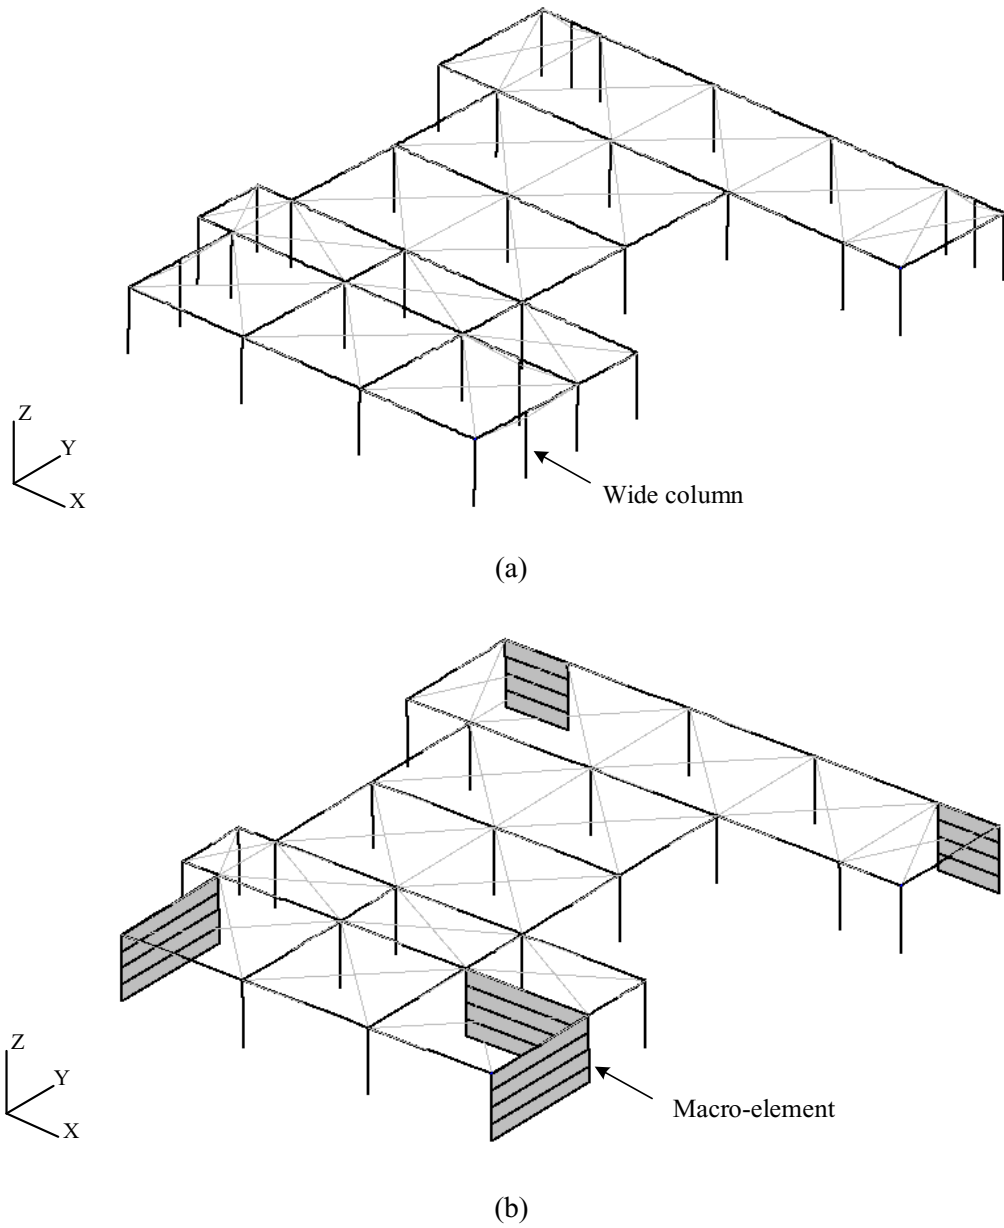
Illustration of RC walls modelling - finite element models of the 4th floor: (a) wide column (WC) model; (b) shear wall macro-element (SWM) model
